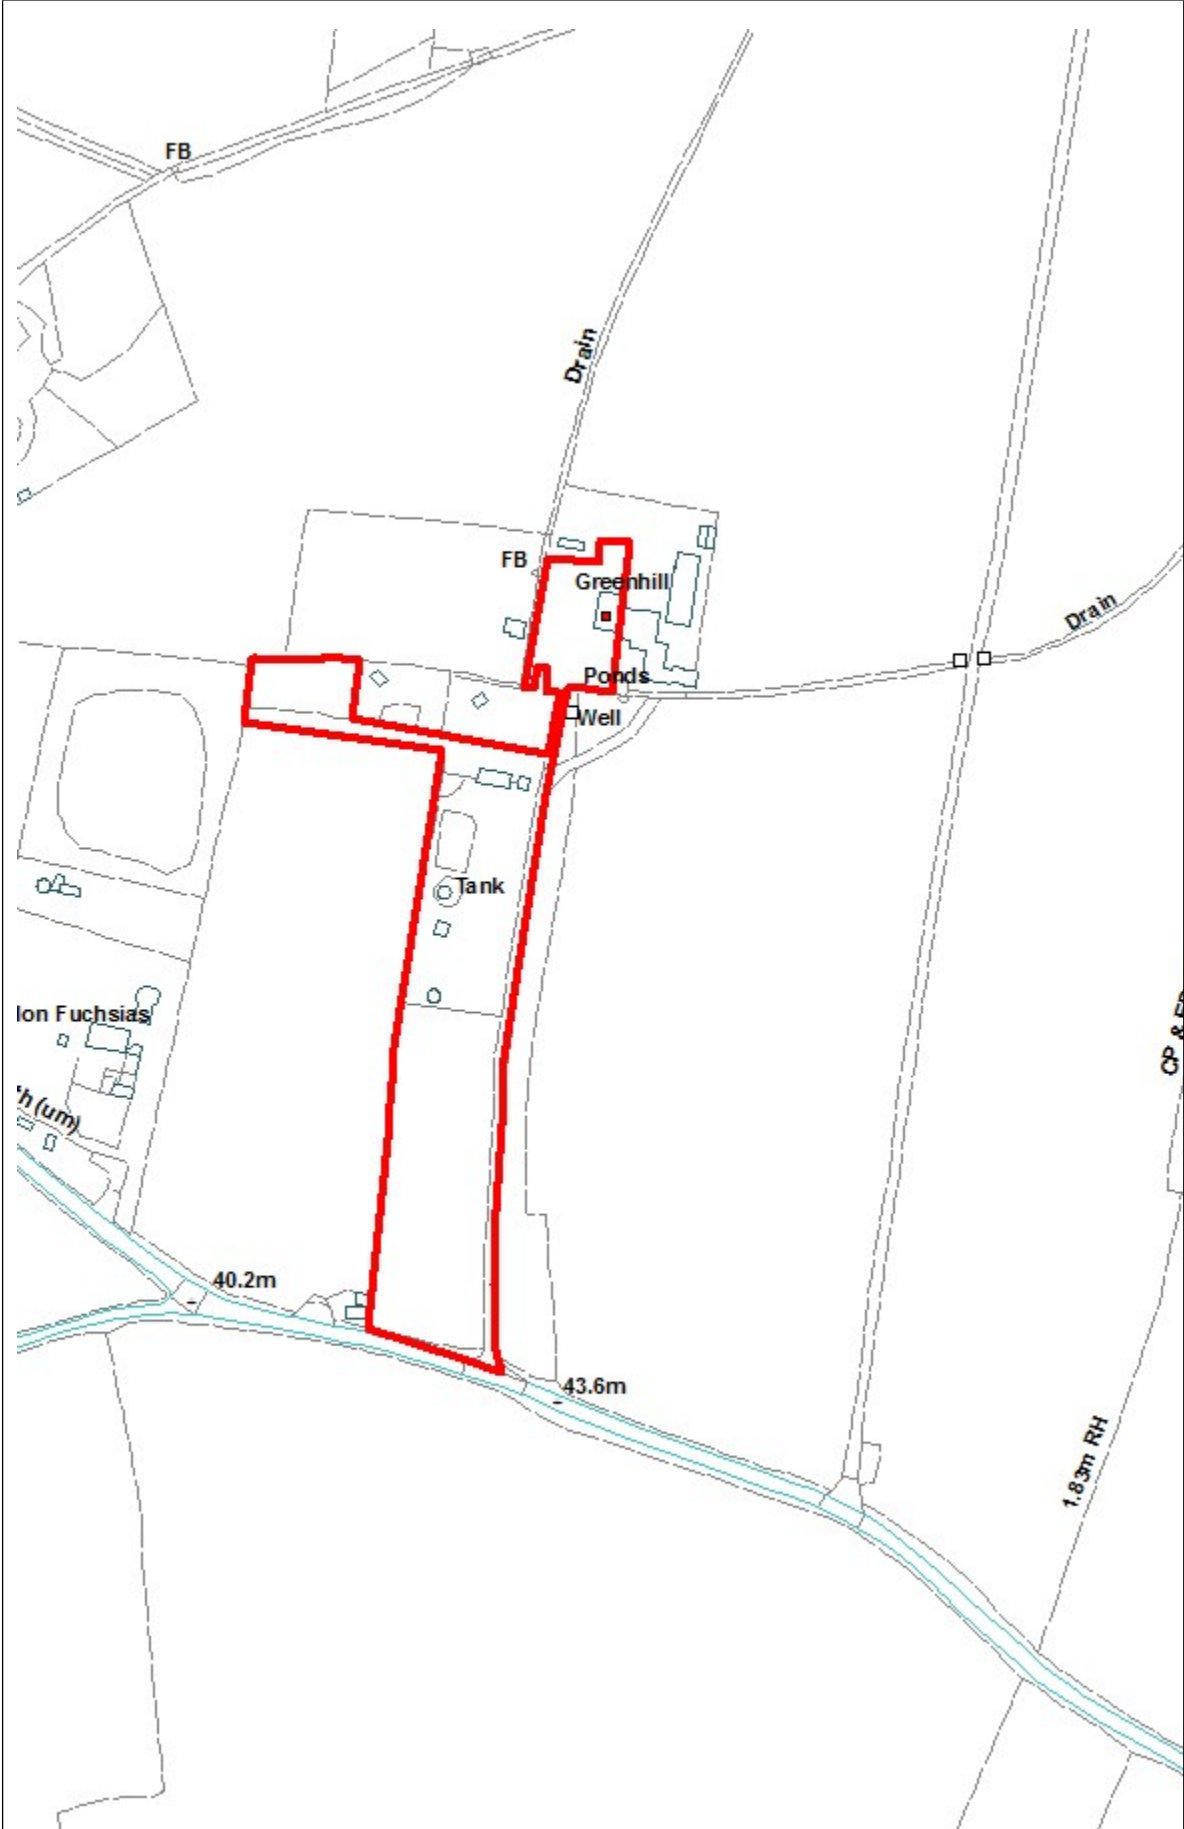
/003 Rev A, Proposed Block Plan received 07.02.22
